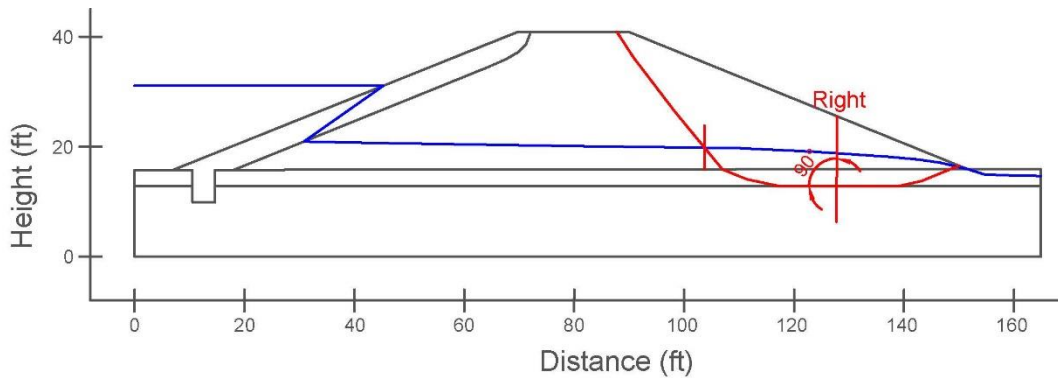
Sub-sectioning of the cross-section and failure plane for Sheffield Dam
